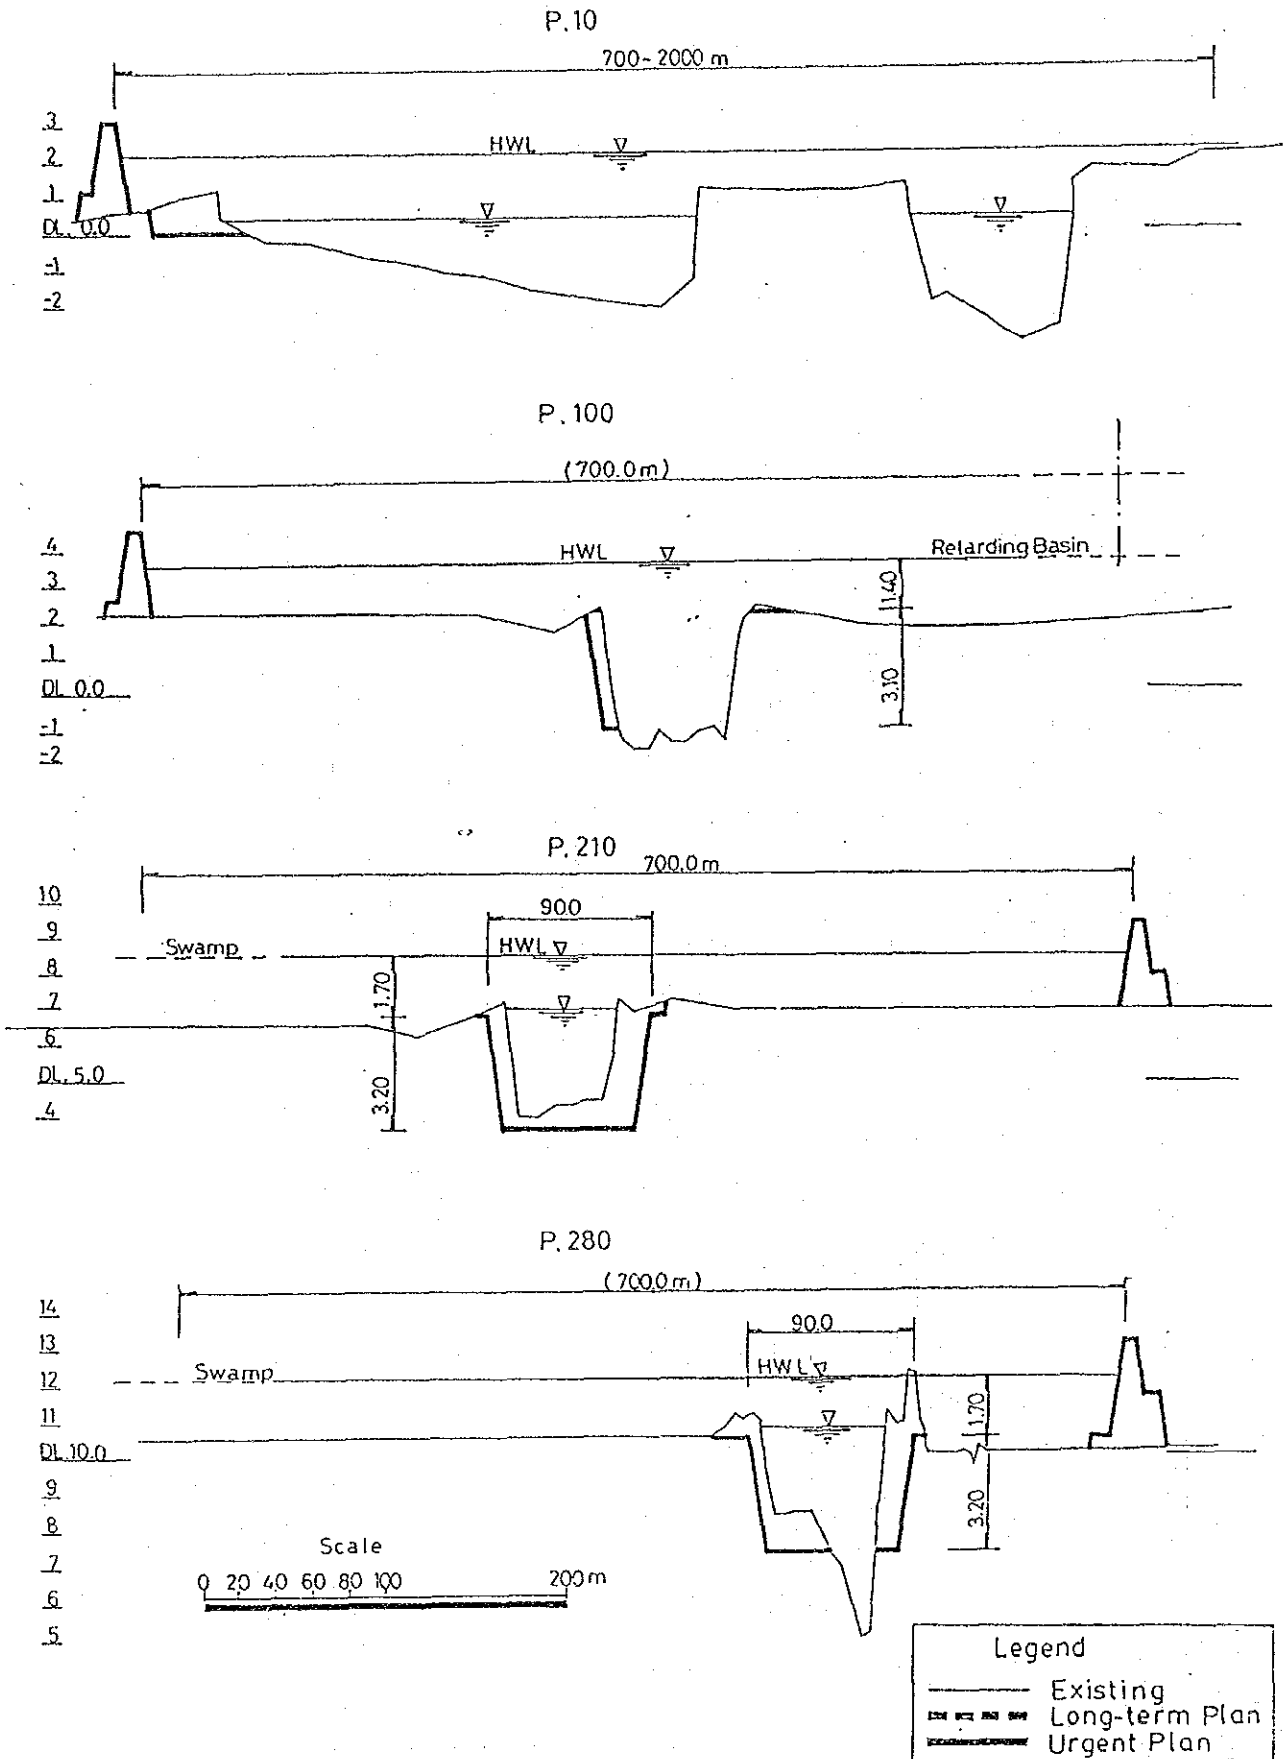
Proposed Long-Term Plan of Asahan and Silau Rivers (4/6)
